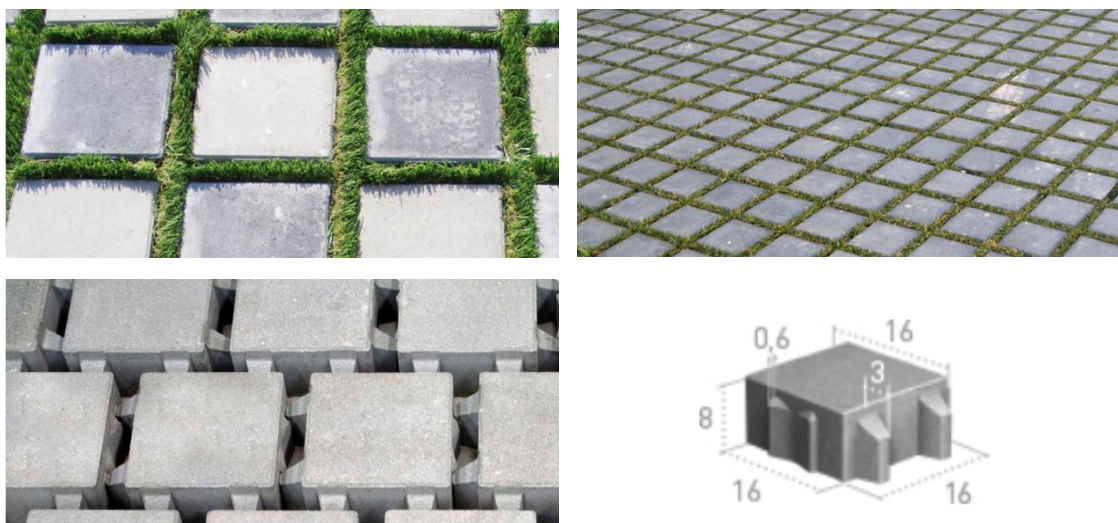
Cycle-pedestrian green pavements detail (Source: www.glsprefabricados.com).
